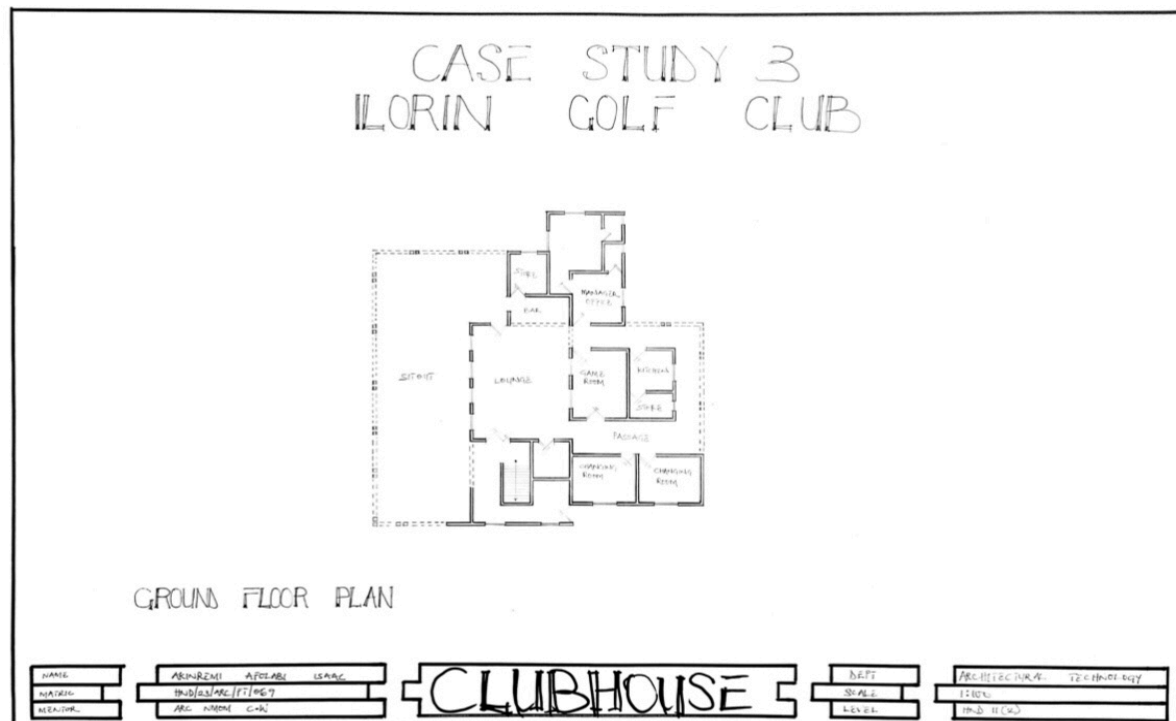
Picture showing floor plan of case study three at Ilorin golf club.
